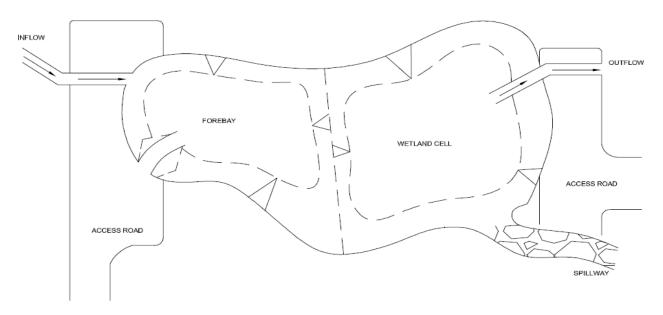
B. Typical Shallow Wetland (Plan View)
